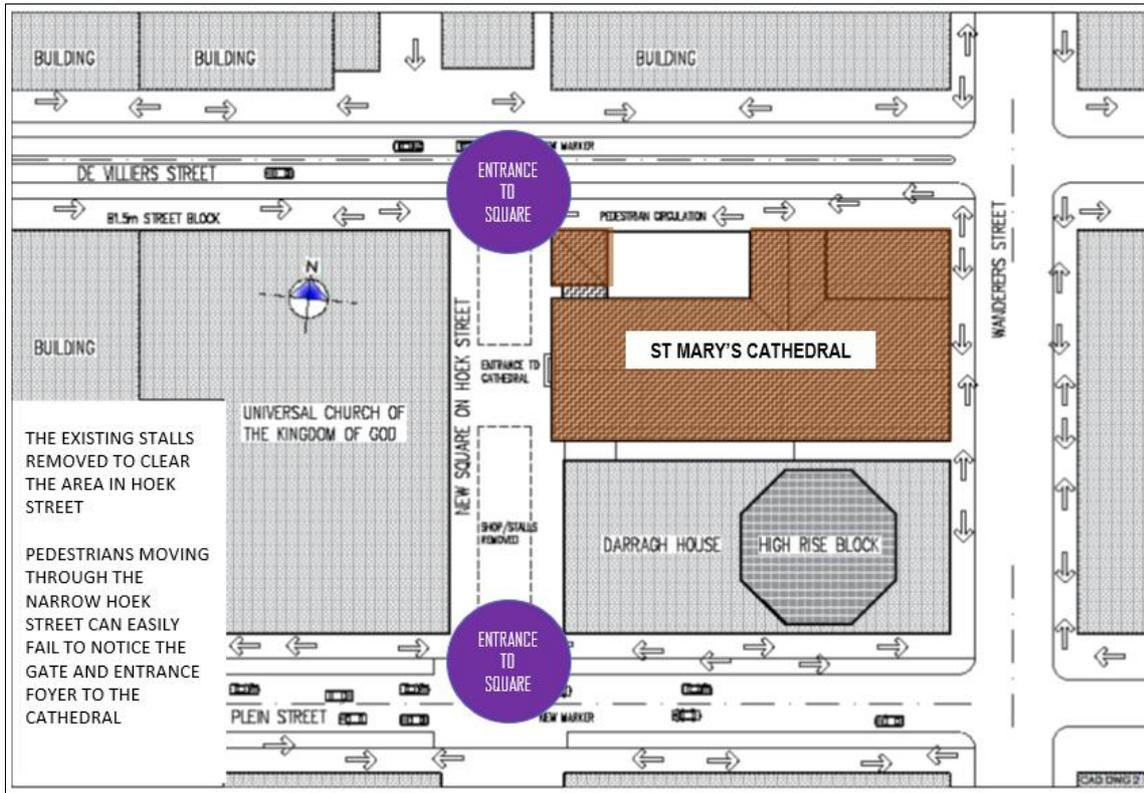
Entrance to Desmond Tutu Square from DeVilliers Street and Plein Street
